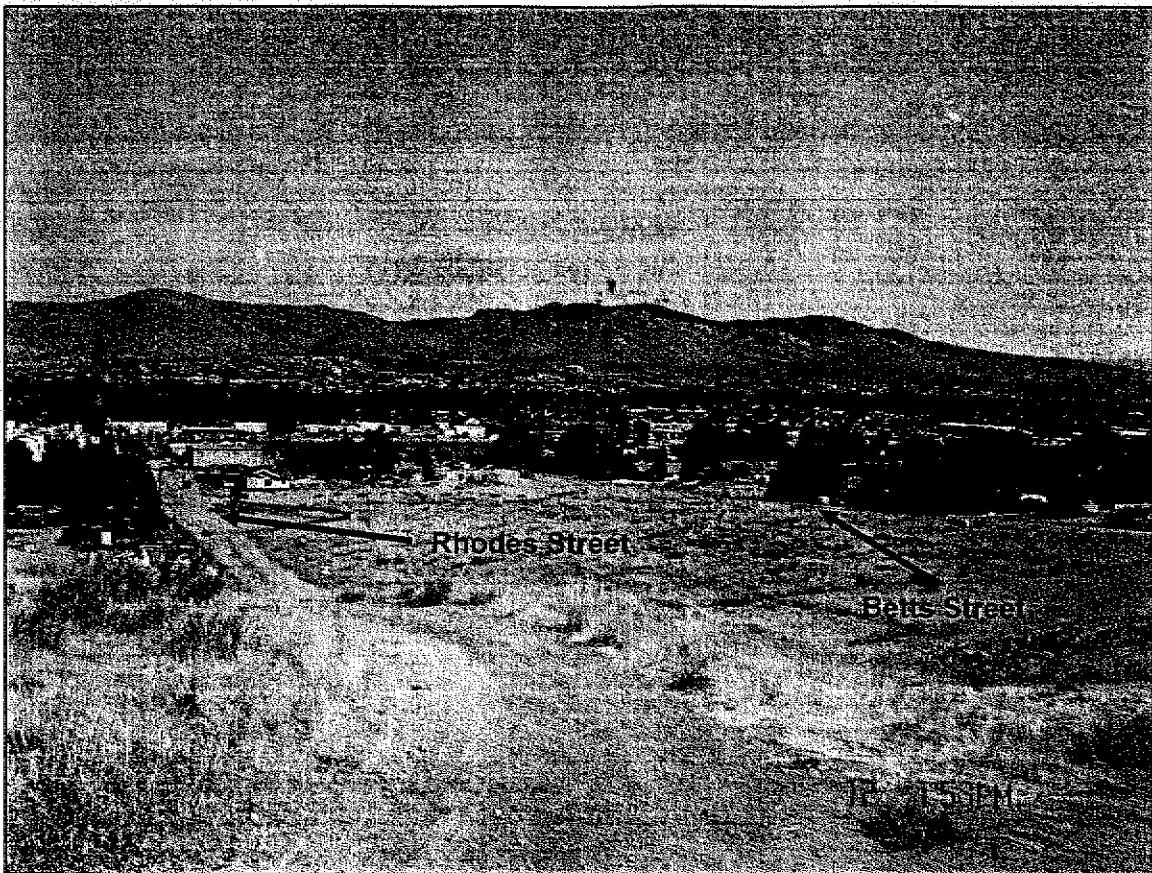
Summerhawk development looking southeast from towards Carson City, Nevada, September 12, 2006.
